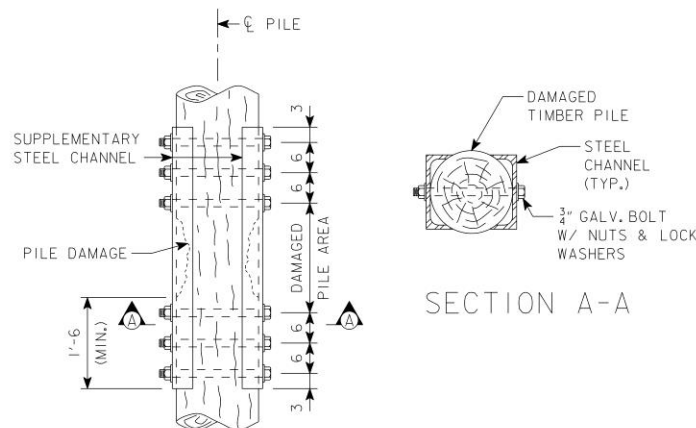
Strengthening Timber Pile with Steel Channels
